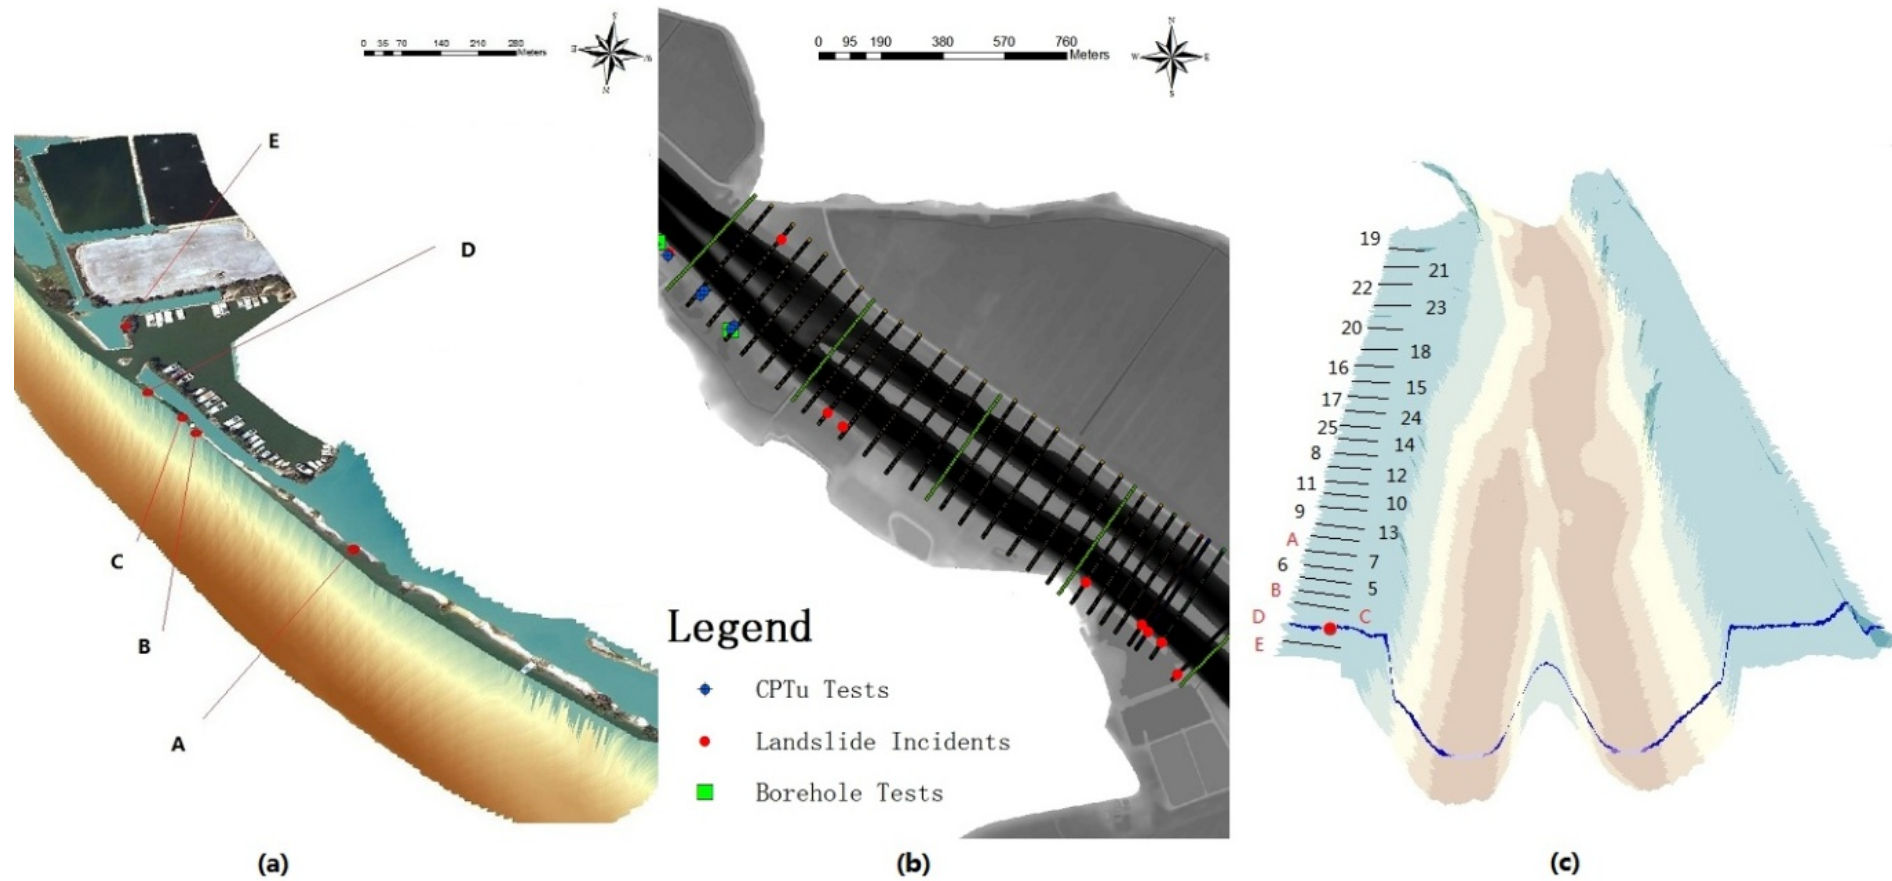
Long Island Marina study site: (a) locations of 5 significant failures; (b) location plan of in situ testing and recorded collapses; (c) distribution of bank cross sections in 3-D view.
